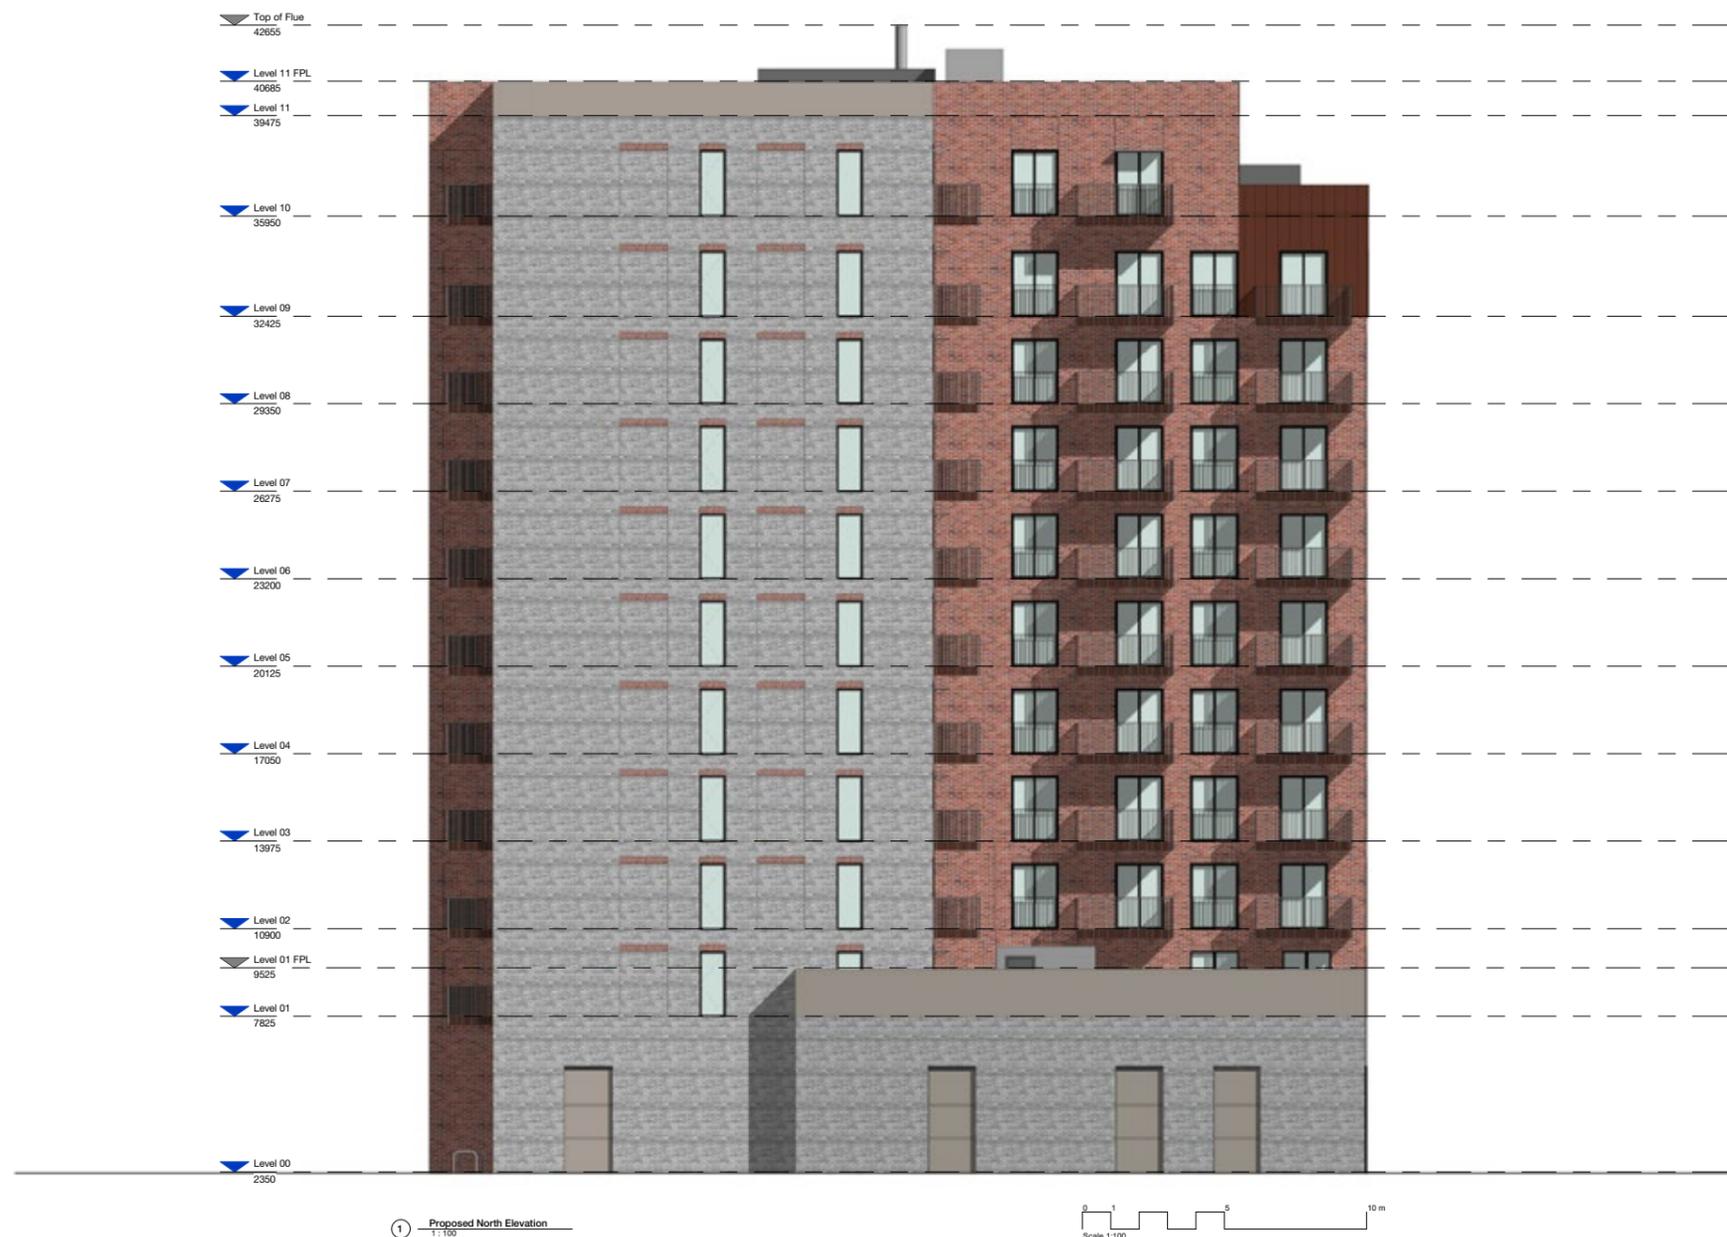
Proposed Development - Illustration - Ossory Road elevation
